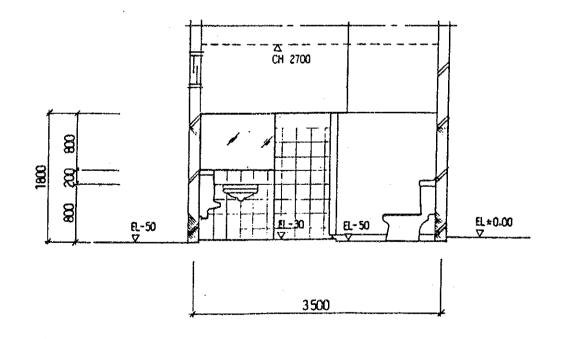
(1) Reformation Plan of Existing Boat House
